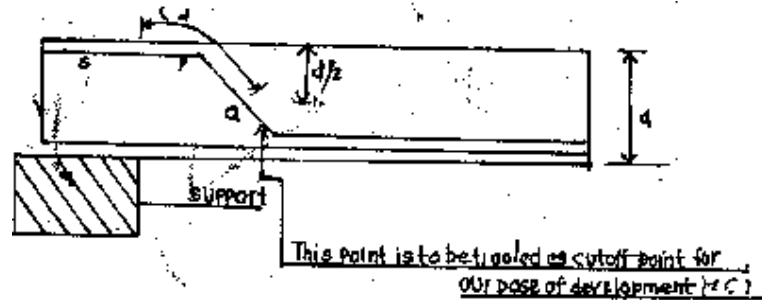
(c) ANCHORING INCLINED BENTUP BARS IN CONPRESSION ZONE
